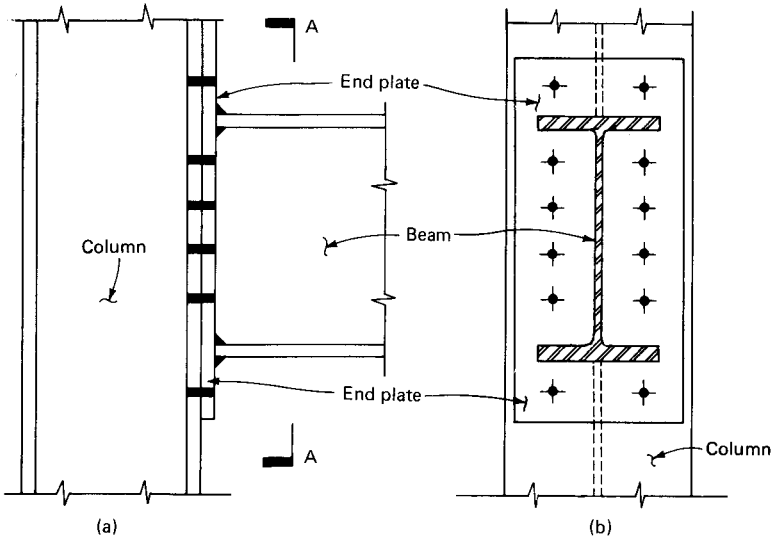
Column-to-beam bolted end plate connection. (a) Elevation; (b) section A-A side view.
